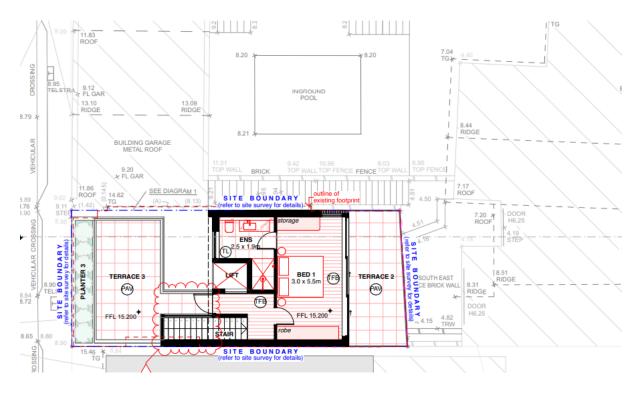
Level 3 floor plan indicating partial easterly view from Terrace 3
